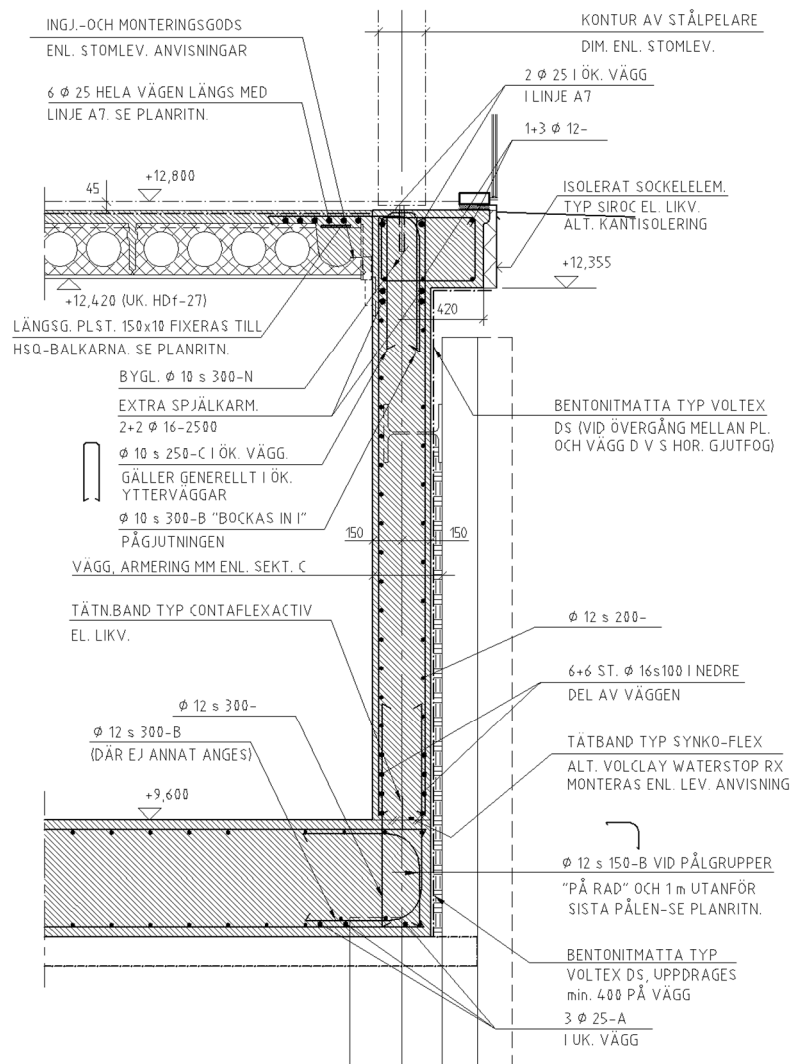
Detailing of wall 1 in object B [in Swedish], from building documentations
